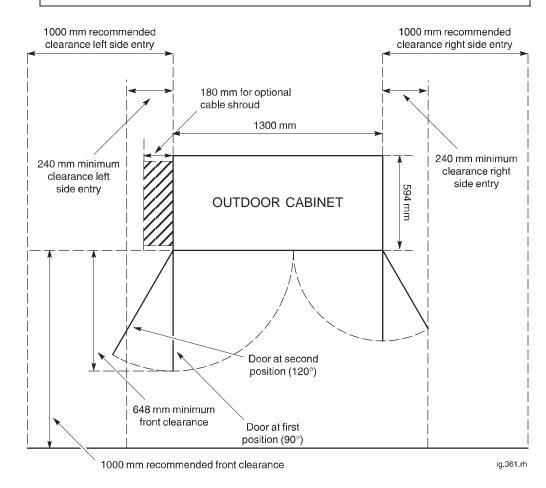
Outdoor cabinet site layout plan view (cable entry on left side)
